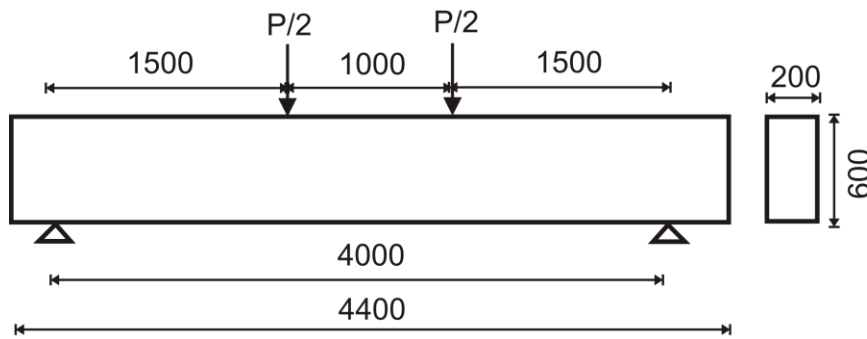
Set up of four-point bending test (Unit: mm)
